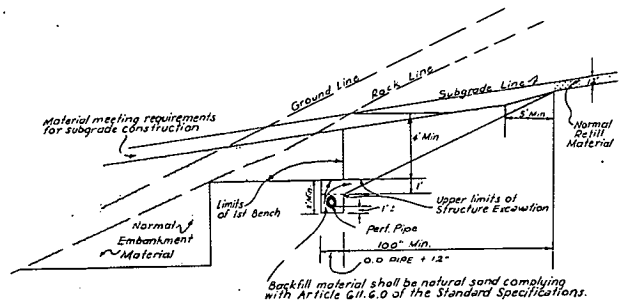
DETAIL FOR TRANSVERSE UNDERDRAIN CUT TO FILL CONDITION
